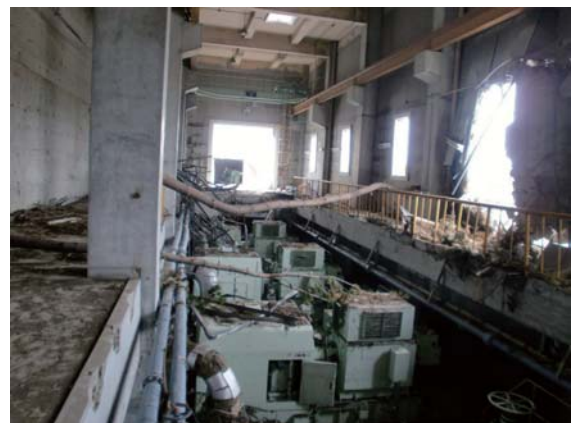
5 Inner part of the air blower building. Air blower and electric motors were covered with the rubble that entered from the destroyed wall
